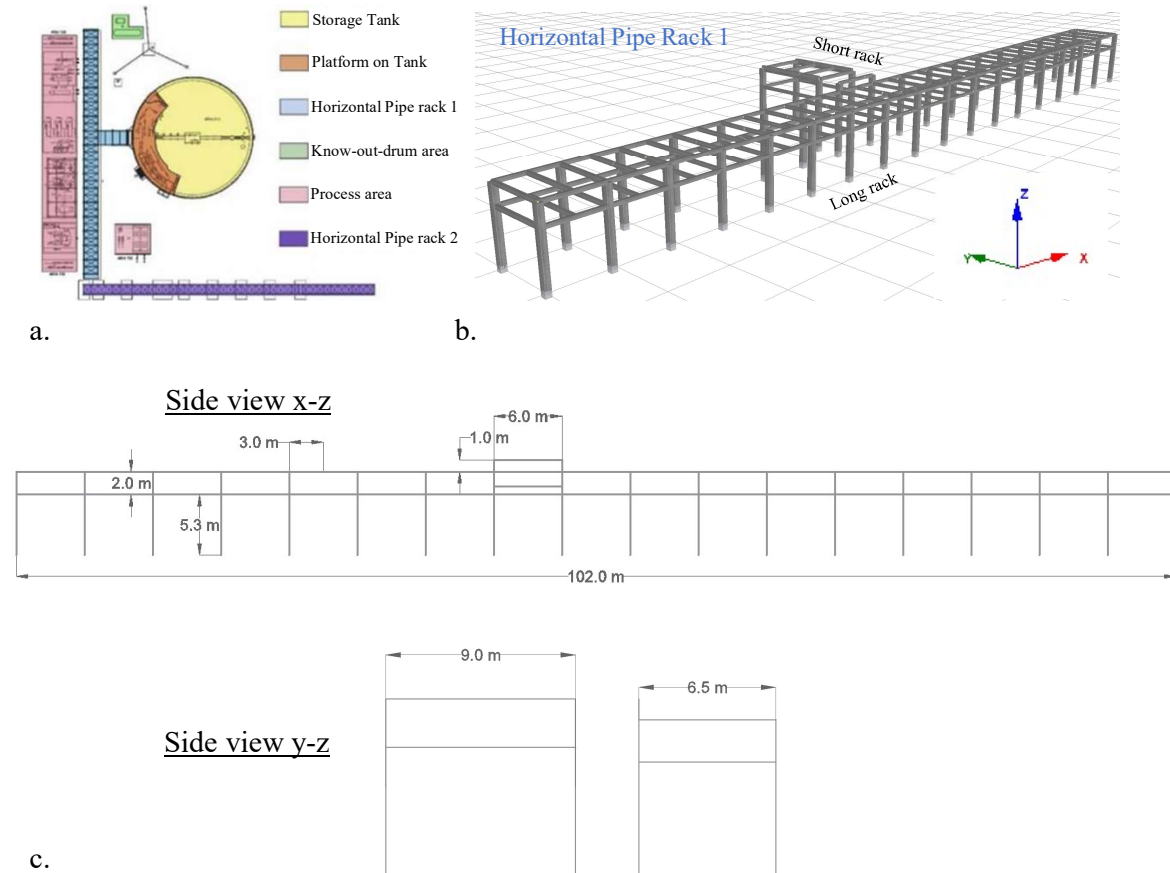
a. LGN terminal layout ([30]), b. RC pipe rack under assessment and c. dimension of the rack
